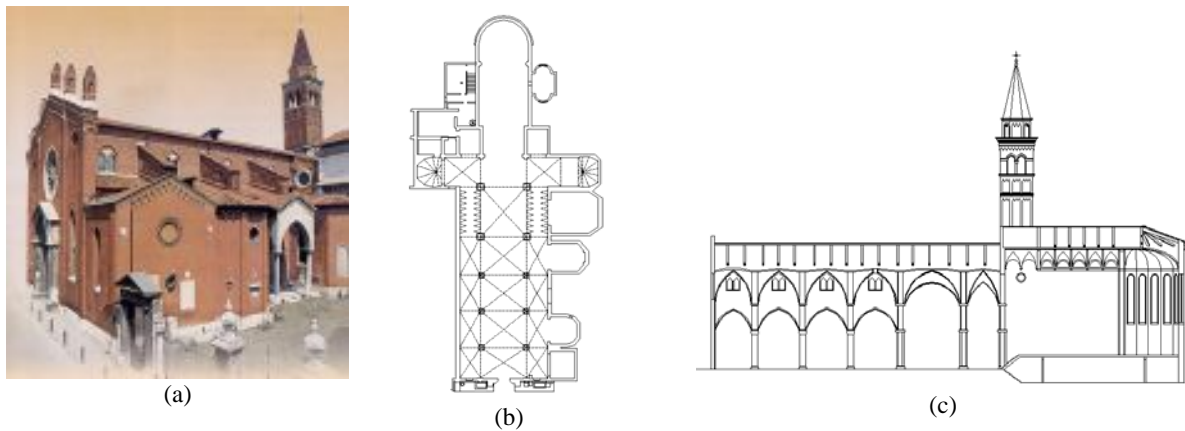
Geometry: (a) photo; (b) plan; (c) longitudinal section [Source: SM engineering, Padua].
